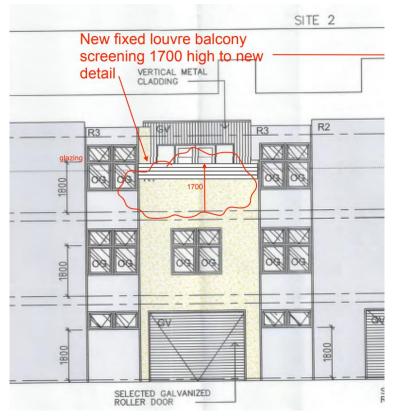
Proposed north elevation (Source: Applicant, October 2024)
